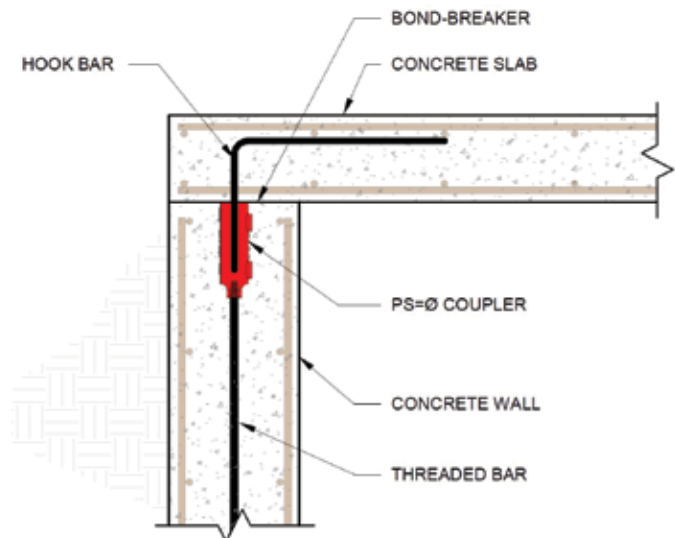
PS=Ø slab-to-wall restraint relief joint over wall
